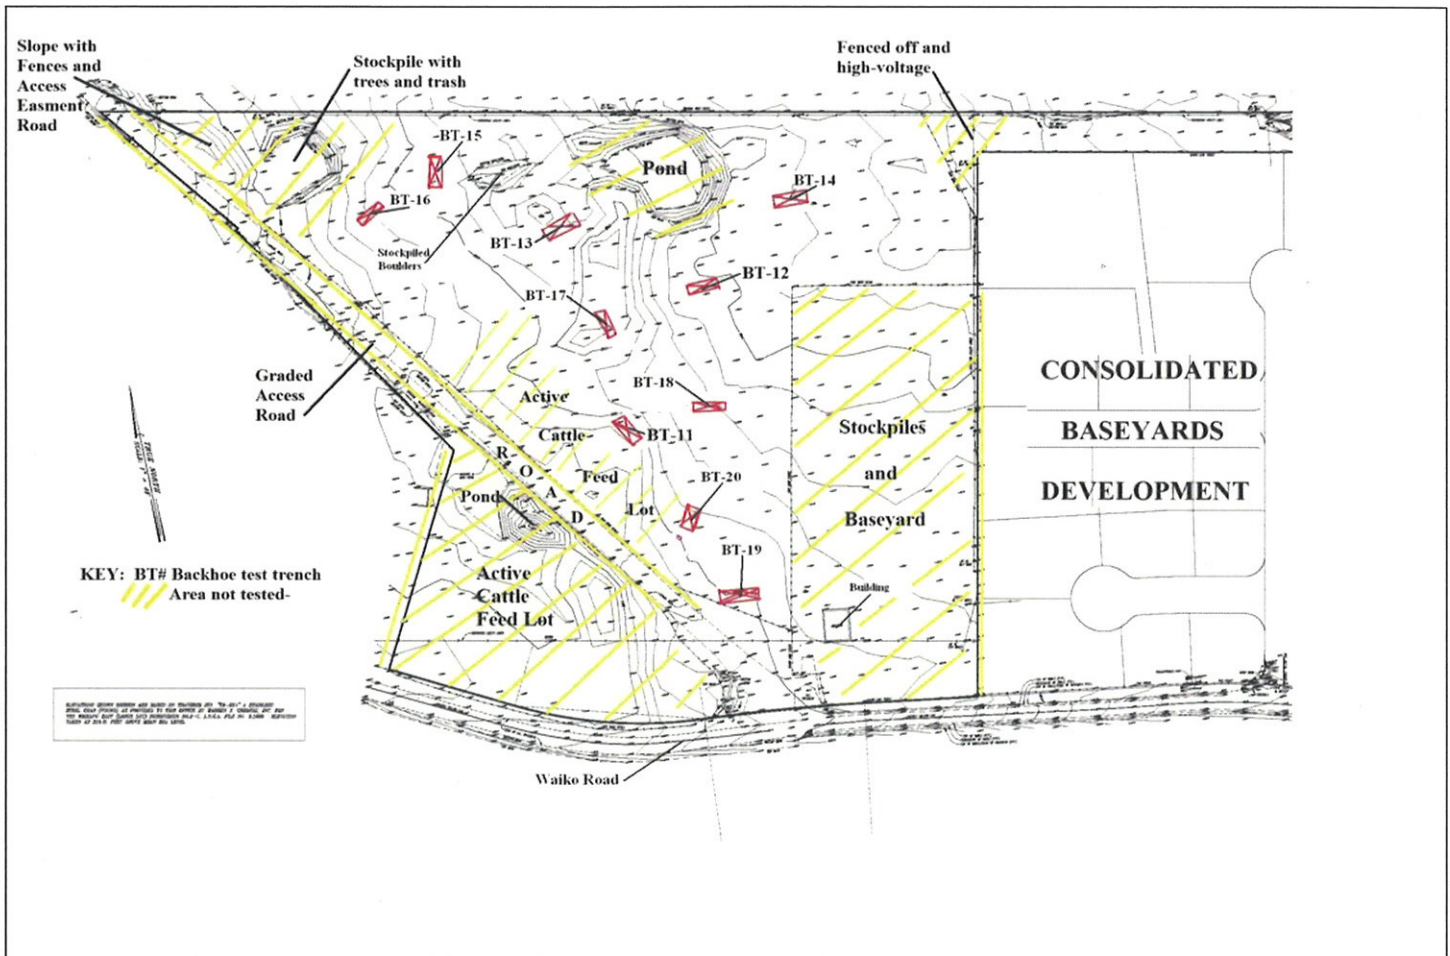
Backhoe Test Trenches 11-20 Location Map-West Section of Subject Area.
